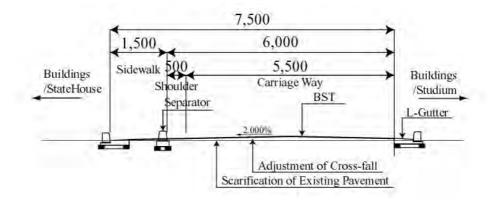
Standard Cross-Section: Tabonikabauea Road in Bairiki (1, with sidewalks)
